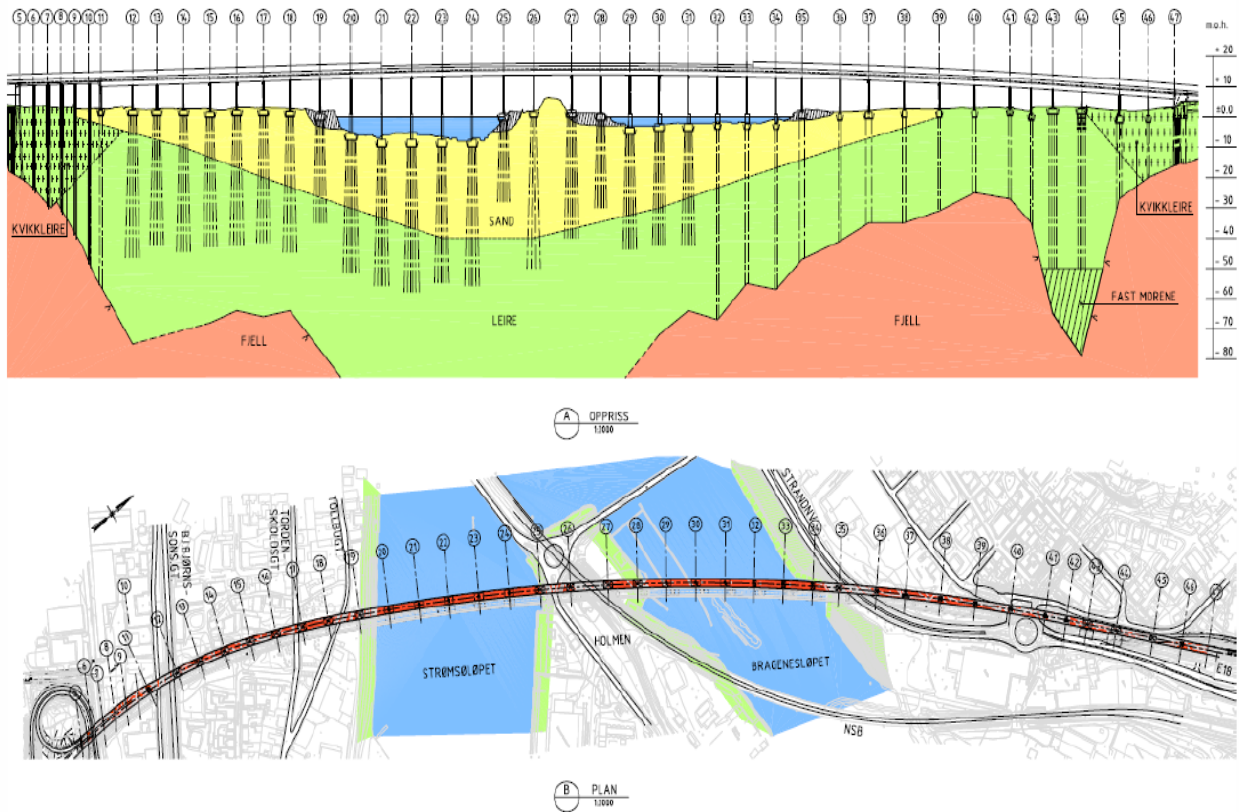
section and plan view of the new bridge project (after Grete Trevdt)
